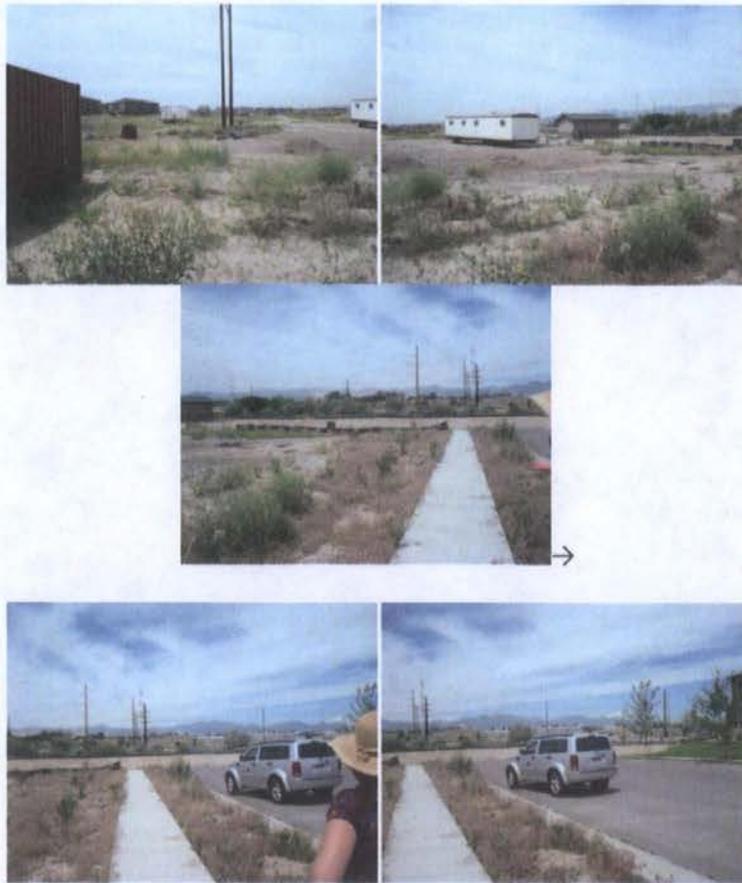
Panorama left to right - Current subdivision being constructed called "Rooftops" Area, area is fill dirt not slag.
